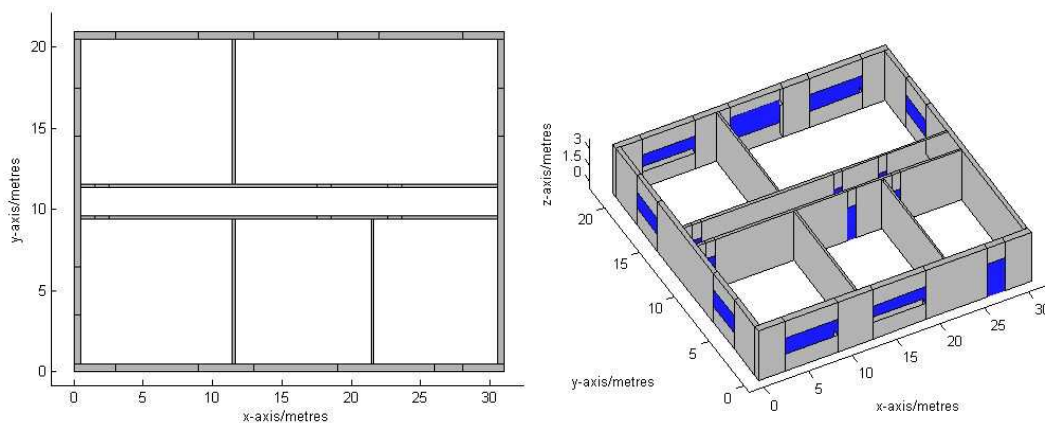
A sample story of a building including doors, windows, exterior and interior walls.
